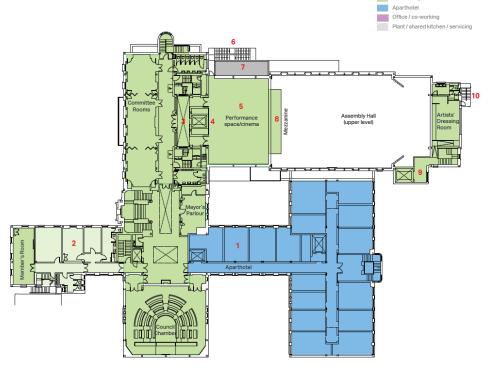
Town Hall - Proposed First Floor (Source Applicant)
